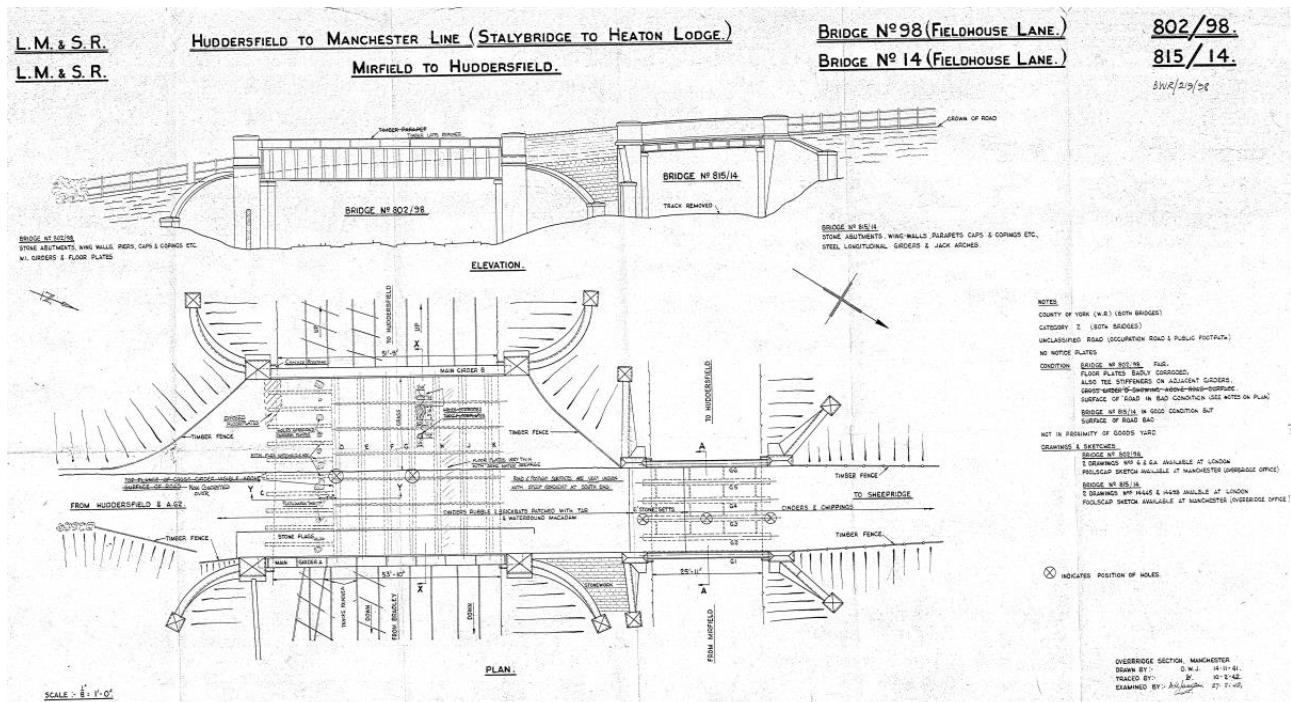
Plan and Elevation of Fieldhouse Overbridge (MVL3/98), 1942 (Network Rail NRG Archives, DMFP00117423).
